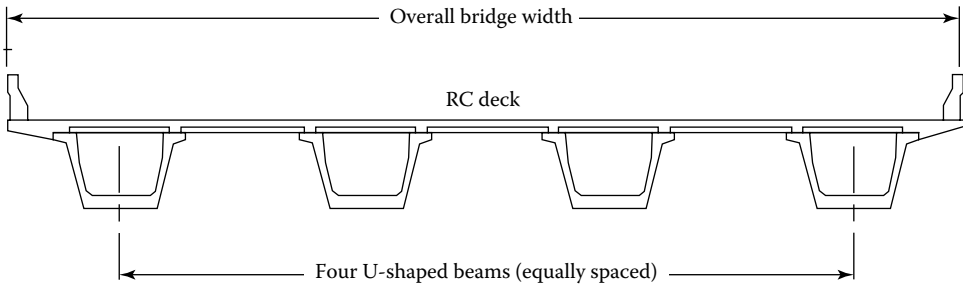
Superstructure system Type *c*: open steel or precast concrete girders.
